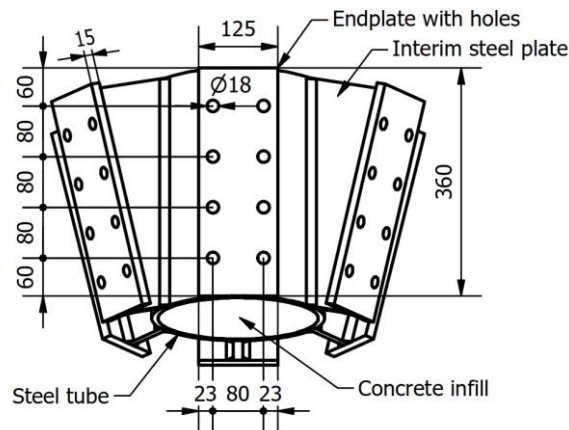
Joint – steel tube with concrete infill and welded steel interim and endplates (view direction perpendicular to one endplate, all dimensions in mm).
